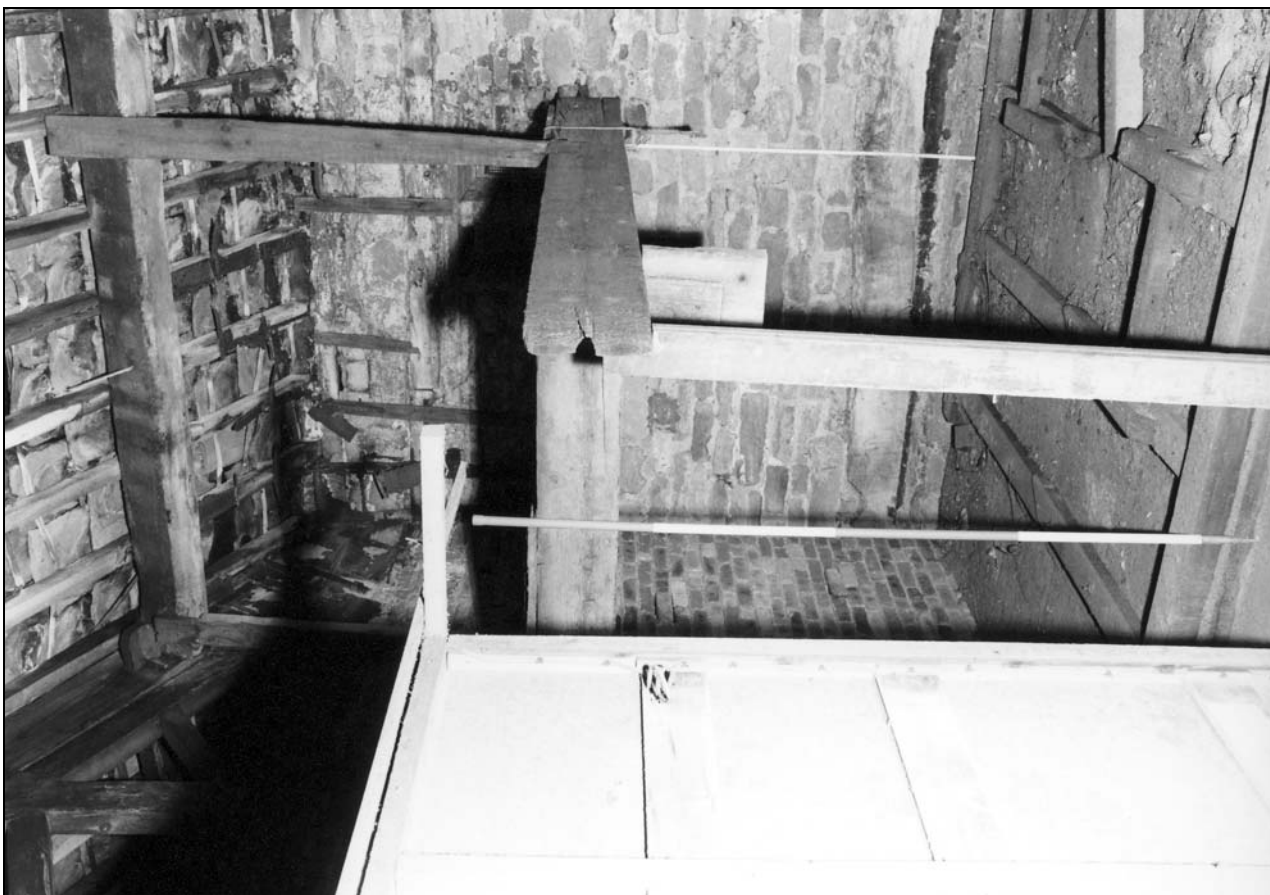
Timber structure at south end of central bay, first floor level – possible remains of pigeon loft (film 3, frame 1)
